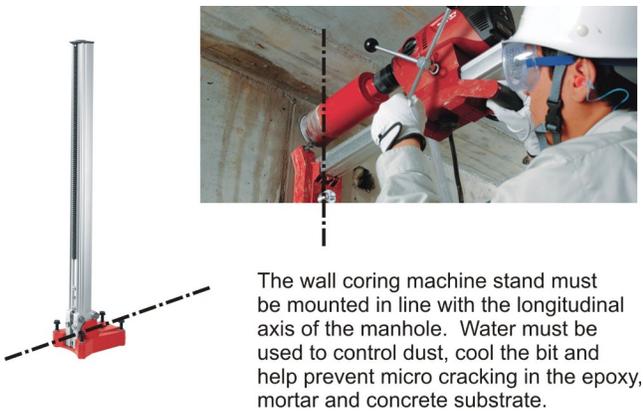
gives an example of a Hilti® coring machine attached to a concrete wall with a single bolt. When using a machine like this, the base of the machine should be checked with a level and adjusted so that it is perfectly perpendicular (aligned with the longitudinal axis of the manhole). Water should always be used to cool the diamond bit while coring. Note that diamond core bits are generally sized based on the hole they create as opposed to creating a plug of a specific diameter. For example, McMaster-Carr sells a 2.25" core bit (part number 2872A34) that claims to have a 2" ID. Because large format adhesion load fixtures are typically 50 mm, this theoretically leaves a plug about 0.030" larger than the dolly.
